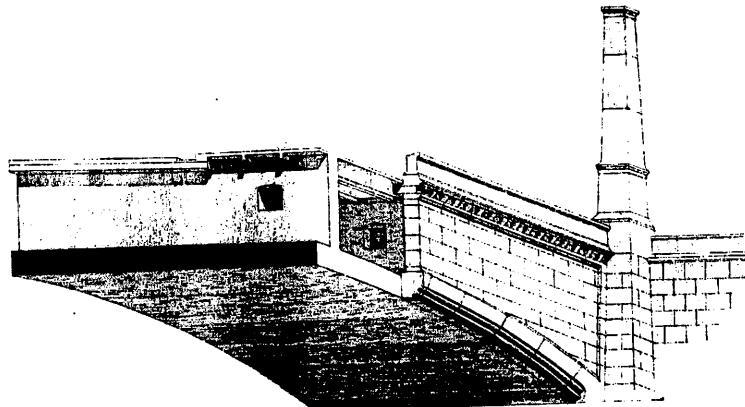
Stauffacher Bridge with a heavy arch that supports the crosswalls and deck as well as the masonry wall façade.
